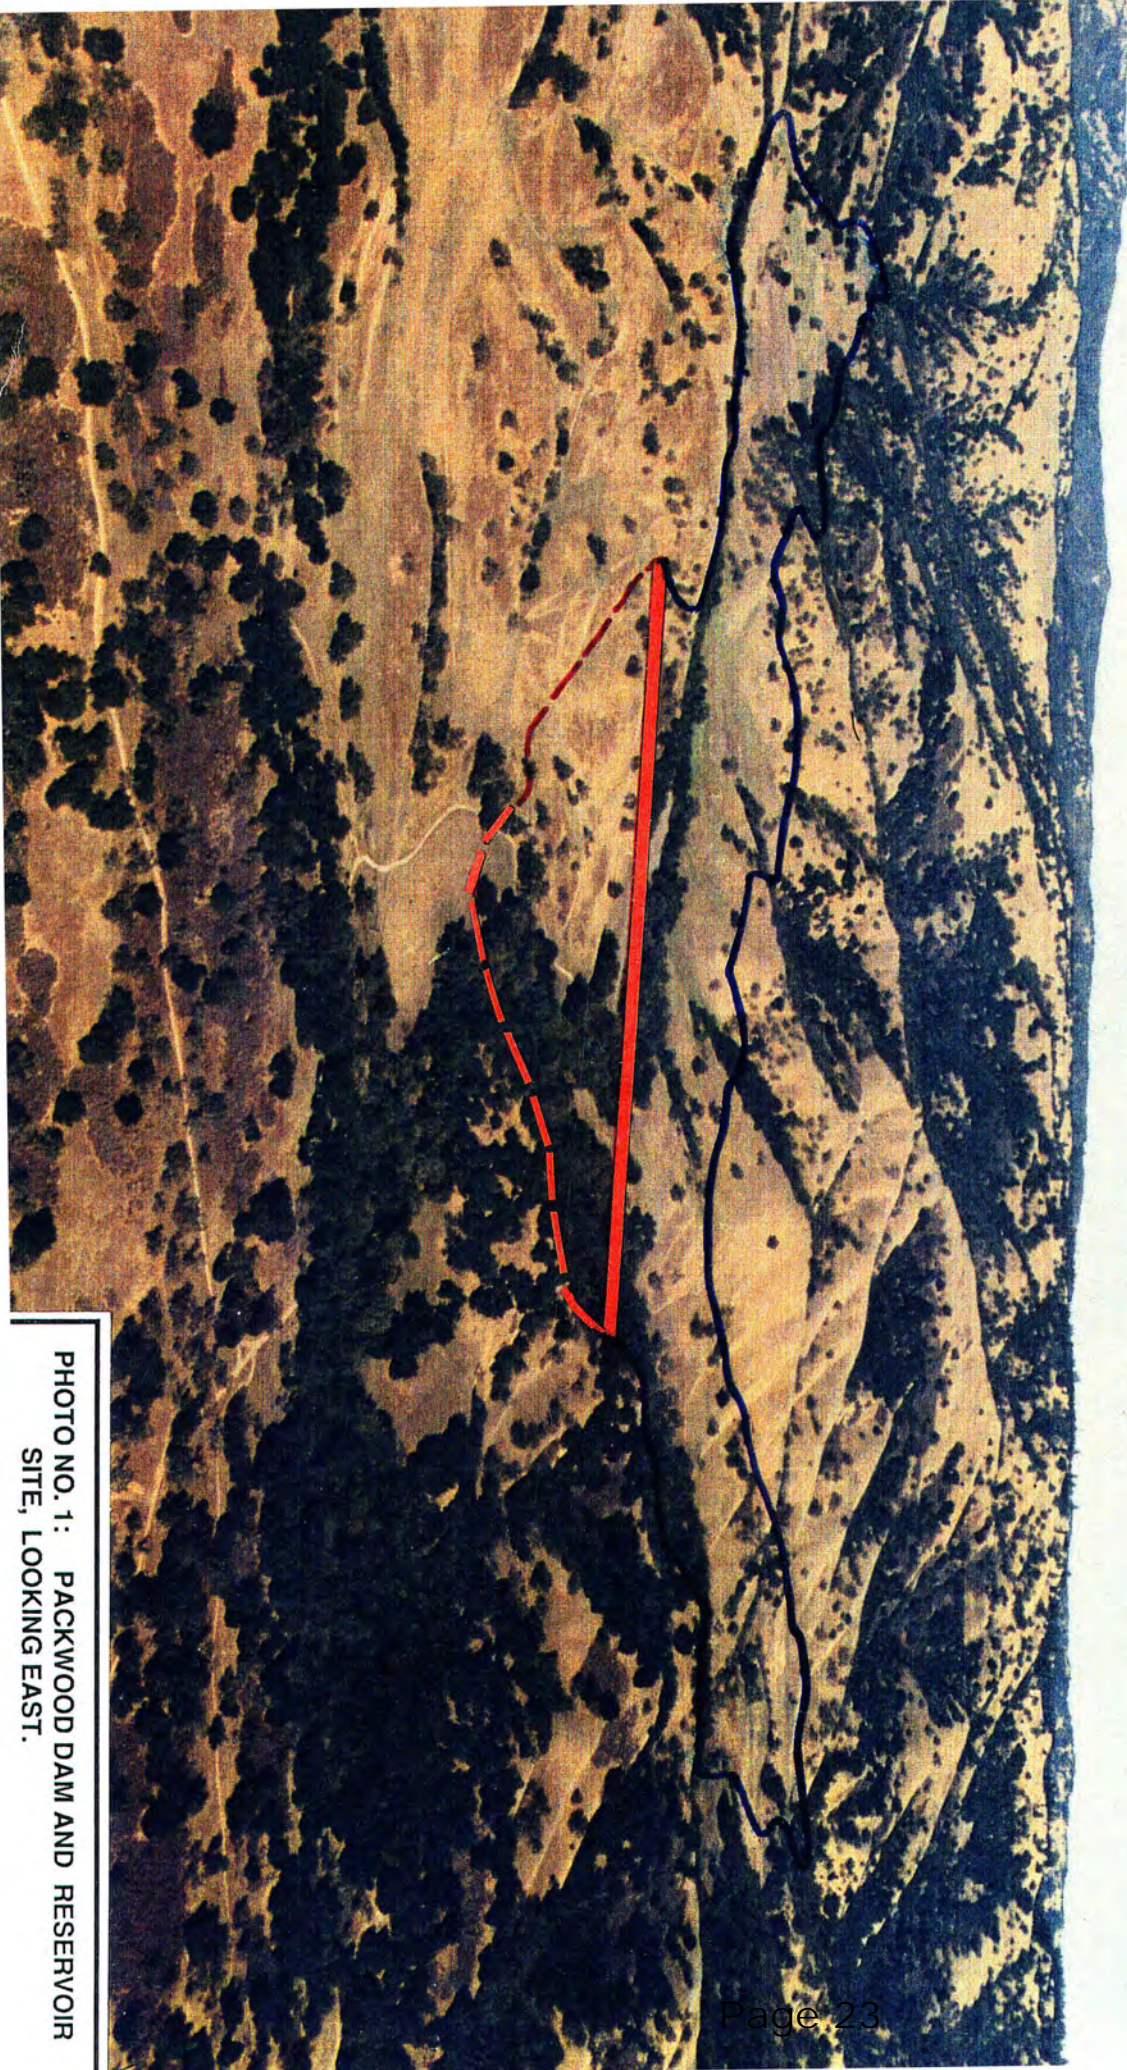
PACKWOOD DAM AND RESERVOIR SITE, LOOKING EAST.
